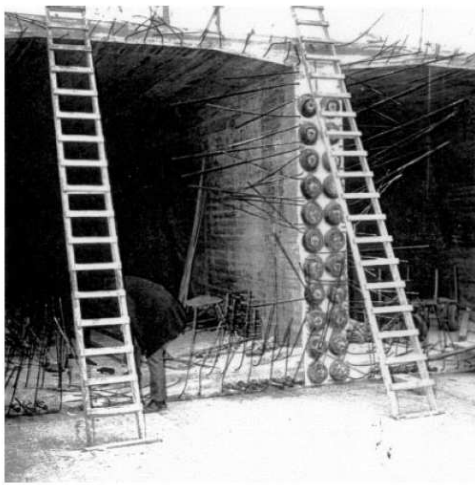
Coupling joint of a prestressed concrete bridge [5]
